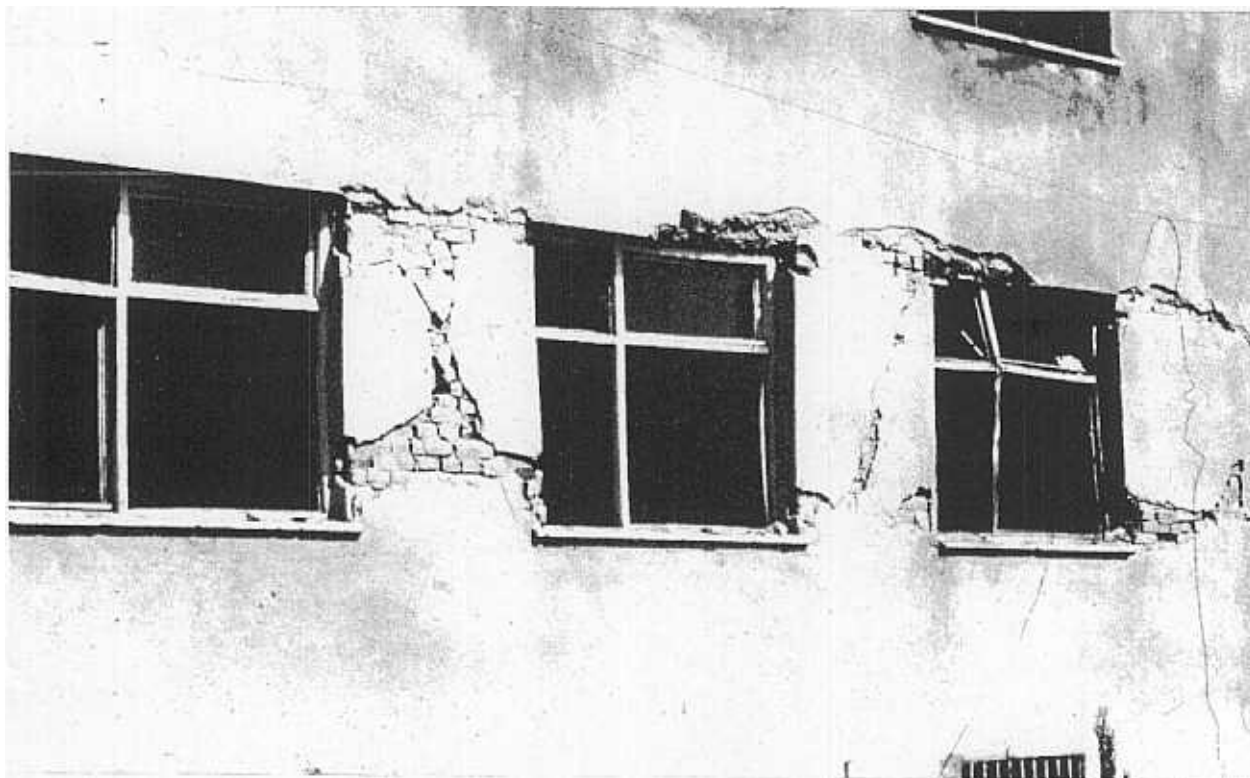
DETAIL OF THE POLICE BUILDING.
